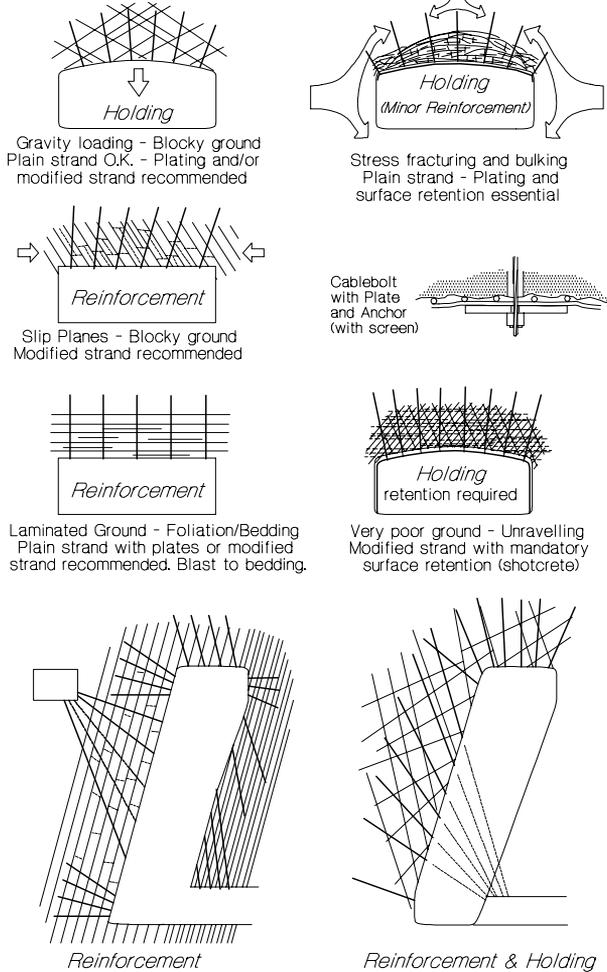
Typical cablebolt functions (*italics indicates cablebolt function only*)
